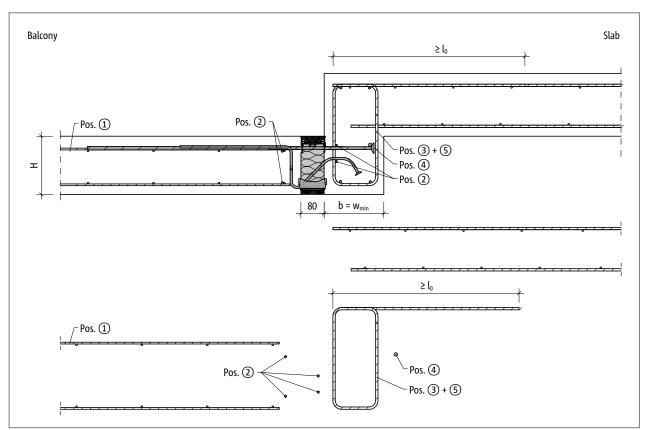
Schöck Isokorb[®] T type K-U: On-site reinforcement for balcony with height offset downwards with minimum structural element dimension ($w_{exist} = w_{min}$)
